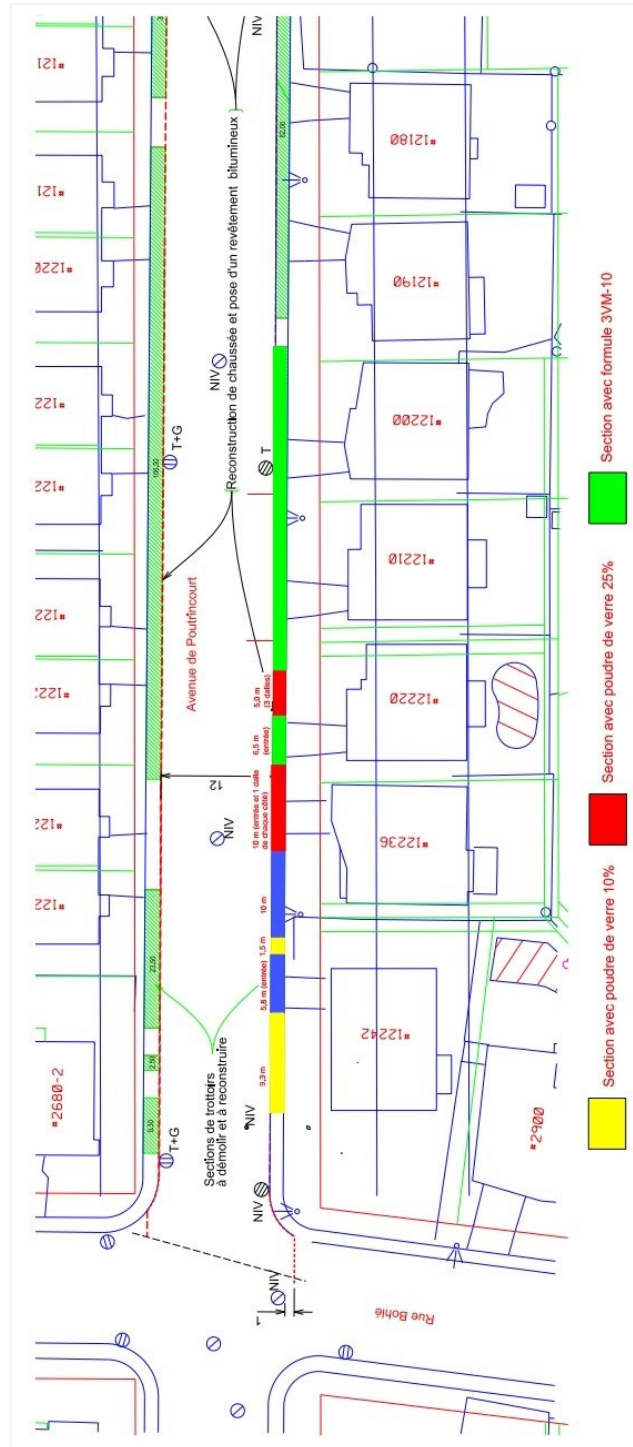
Sidewalks street location - Av. Poutrincourt between Av. Louis Danton and rue Viel, Montreal, QC.CA.
